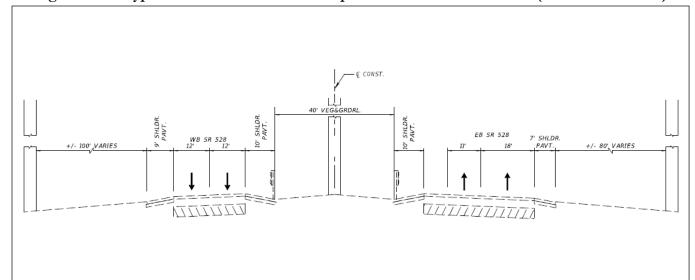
Typical Section at SR 528 Underpass at West Entrance Drive (Structure #754128)
